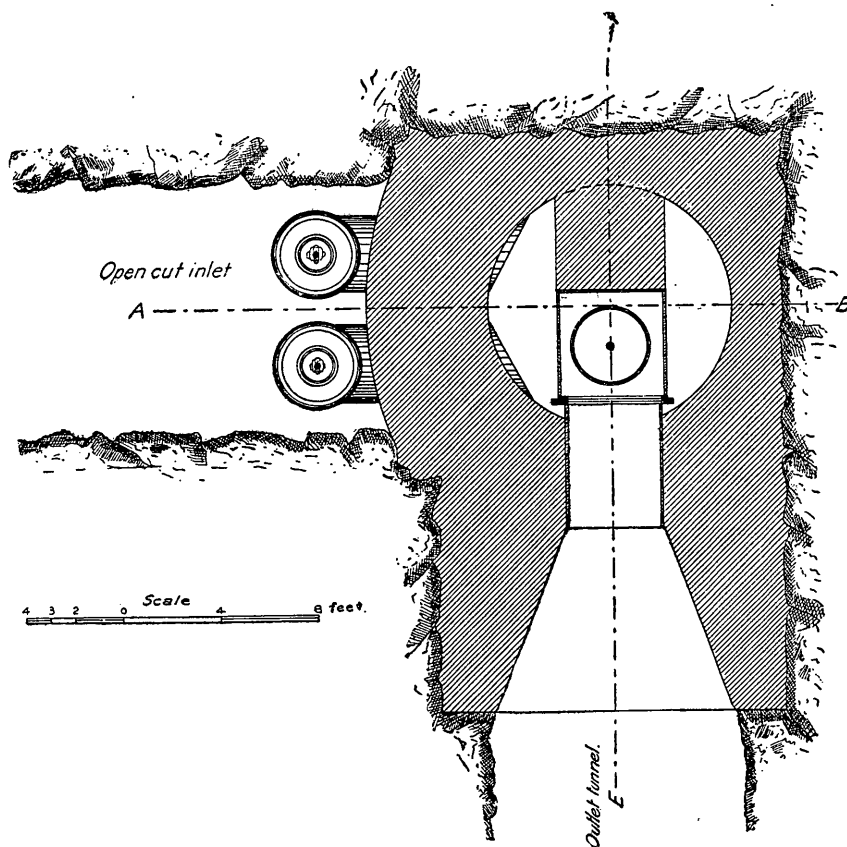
Horizontal section showing details of inlet and outlet in valve towers of Hetch Hetchy reservoir.
